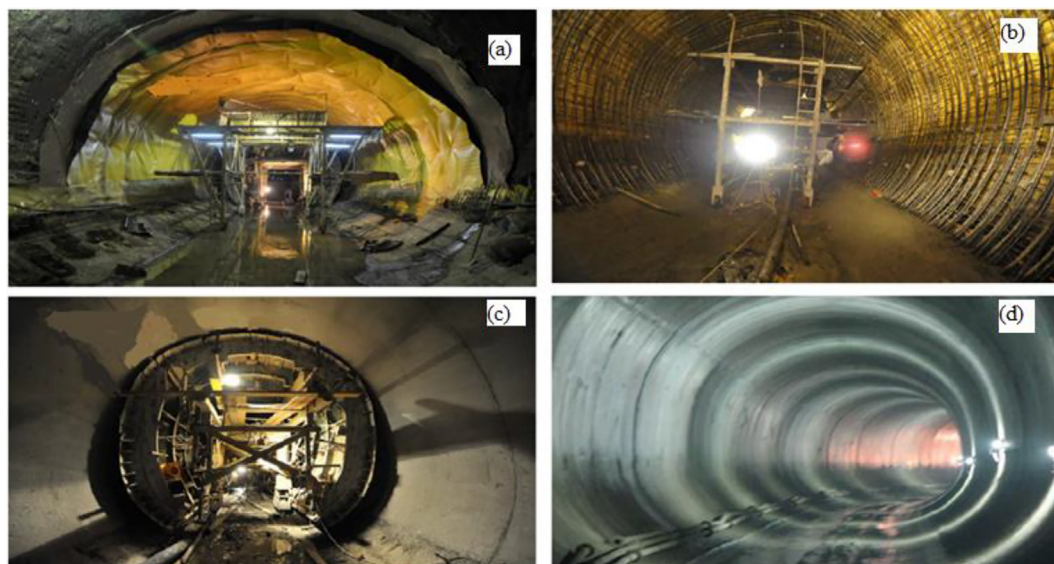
Stages of tunnel lining with cast concrete (Araz, 2019).
